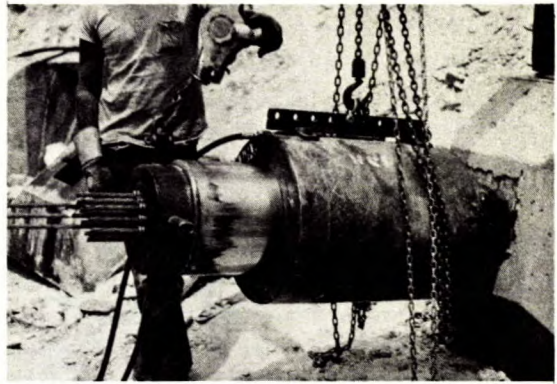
Stressing a regular anchor with a 500 ton jack
